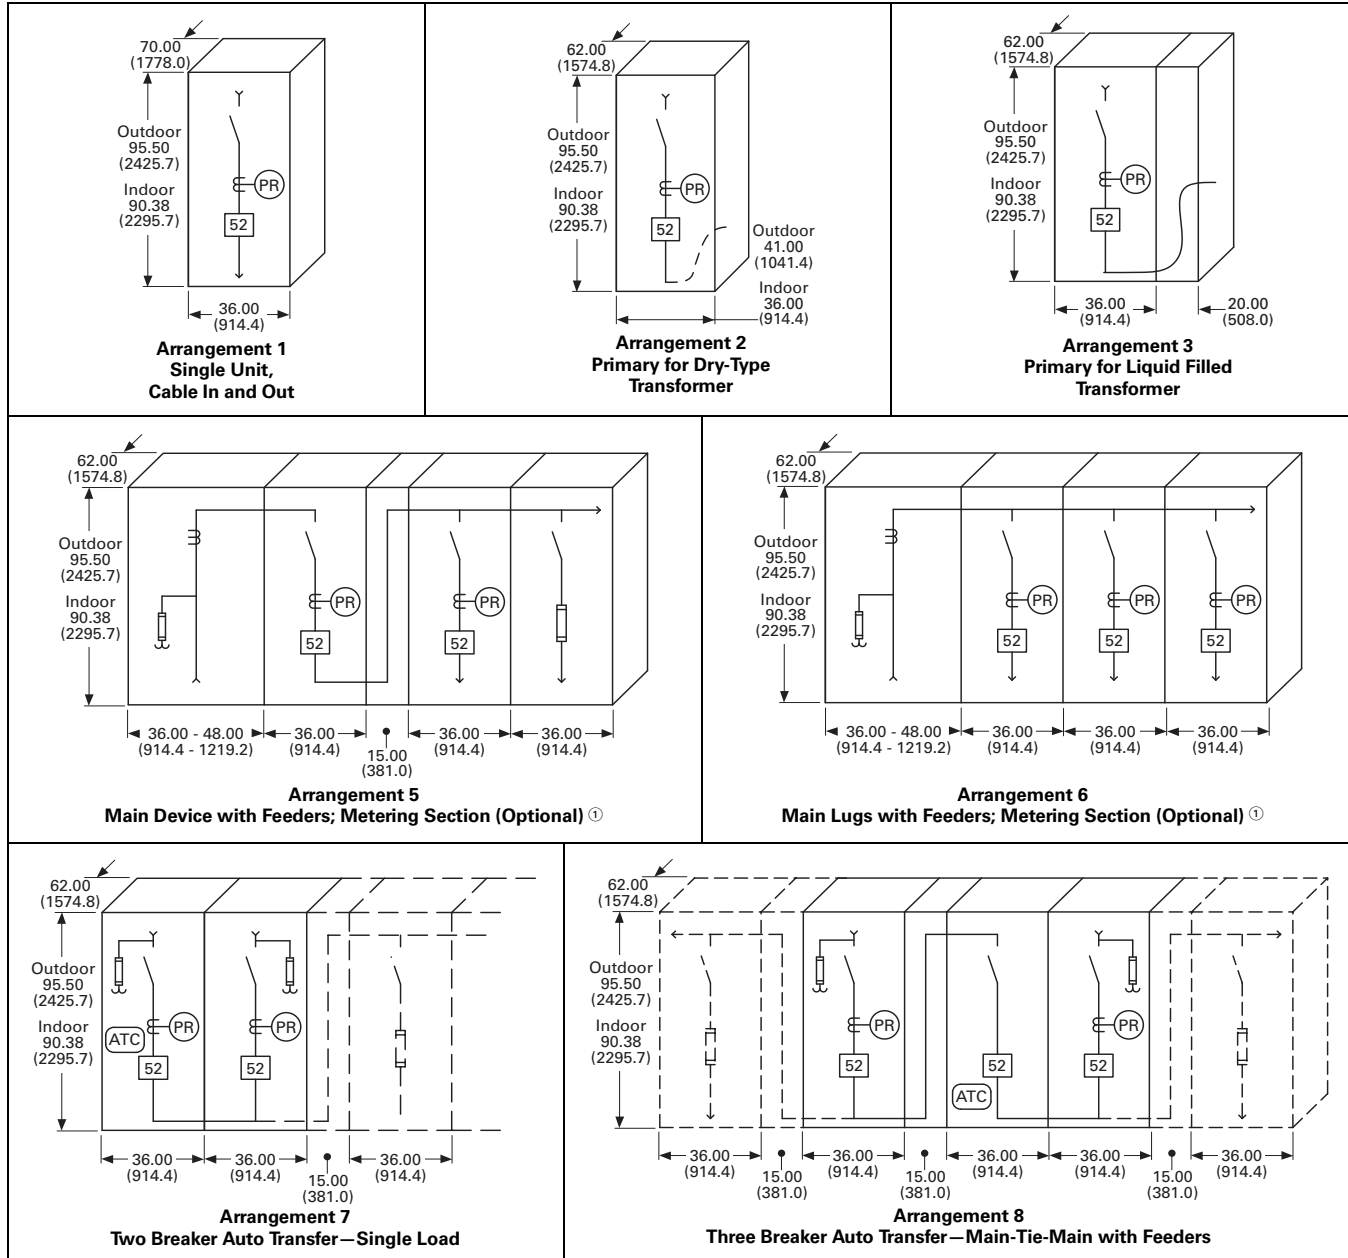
Layouts and Dimensions in Inches (mm)
